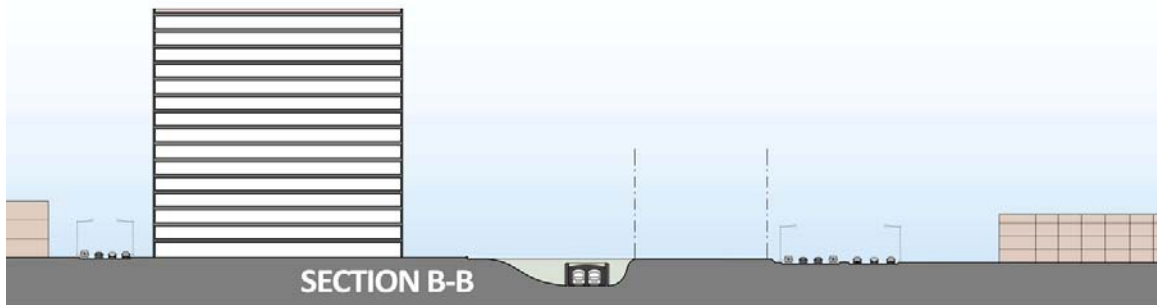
Site A; Section B-B through Bolton North Apartments, Rail Line, Site A, and W. North Avenue
